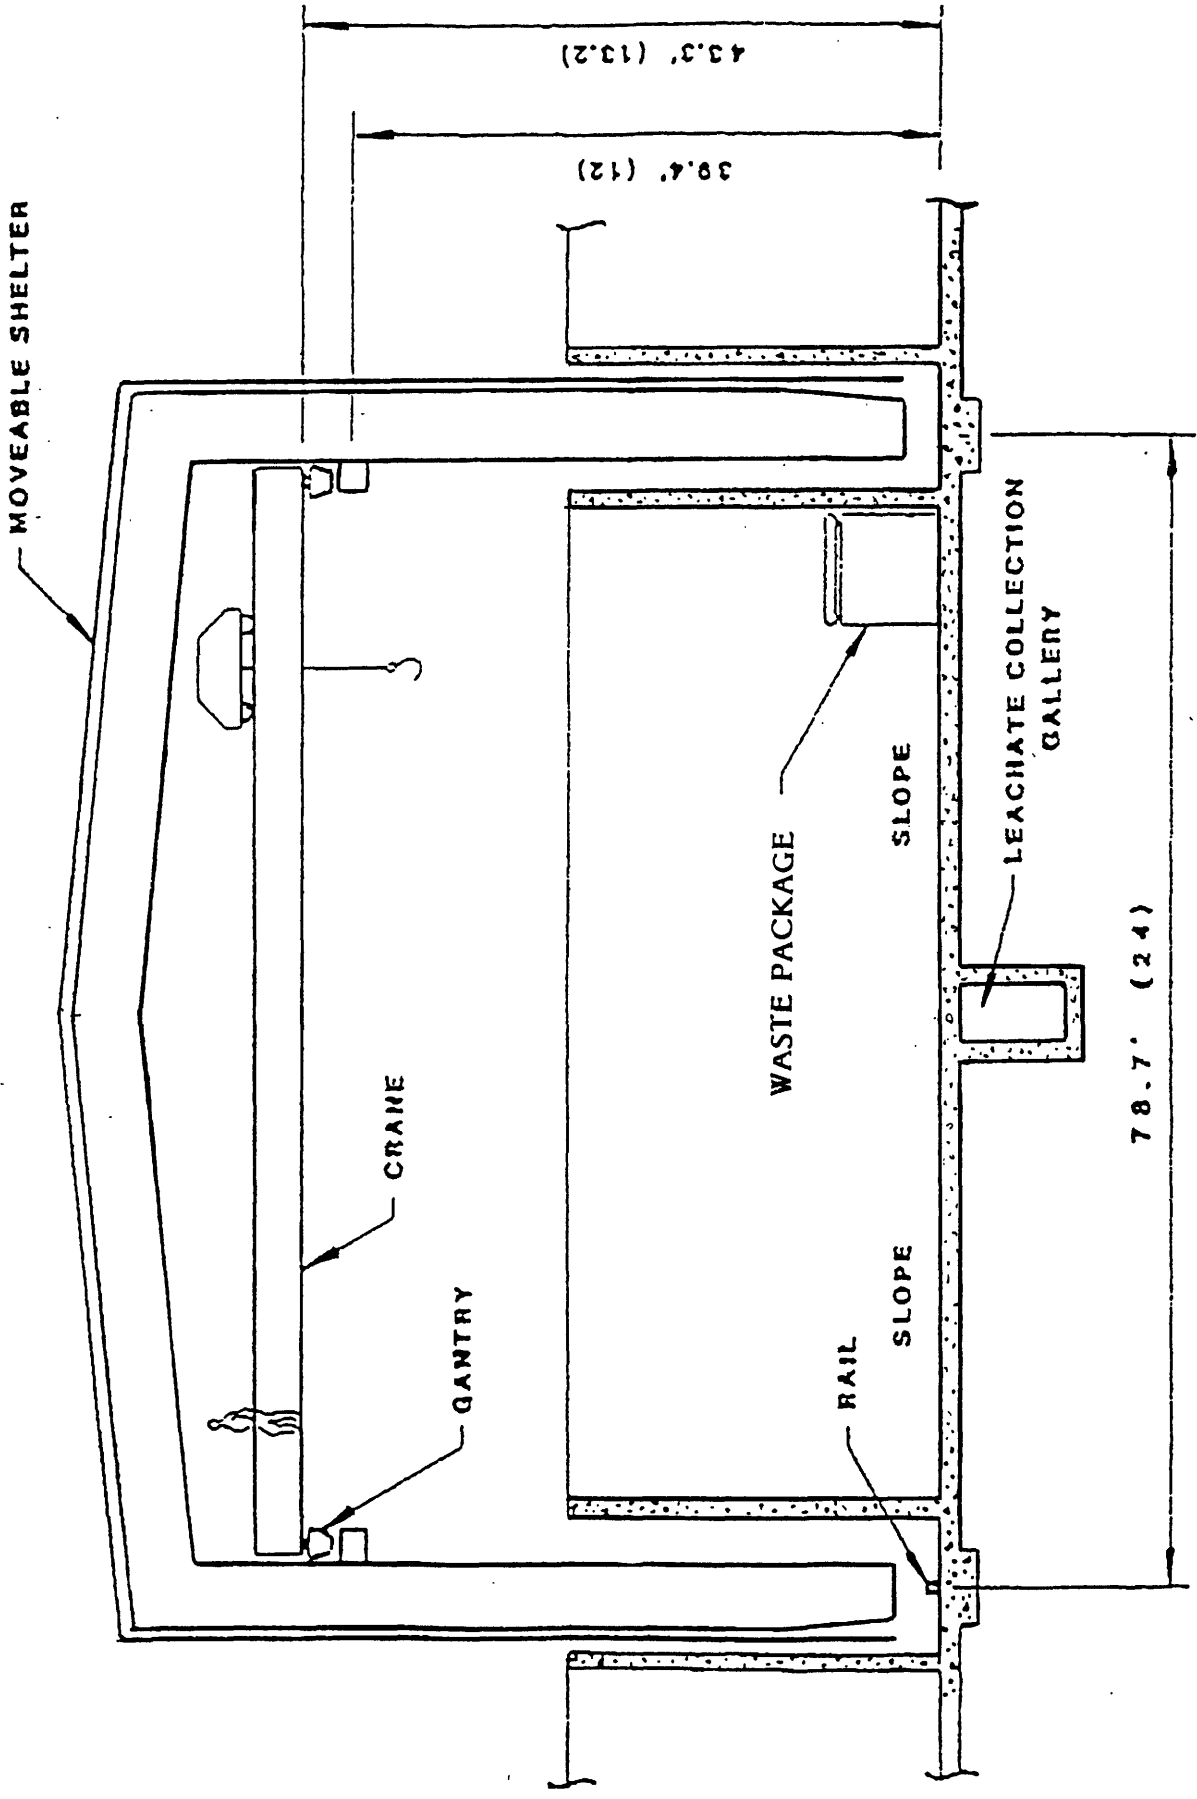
DISPOSAL MODULE SIDE SECTION VIEW
